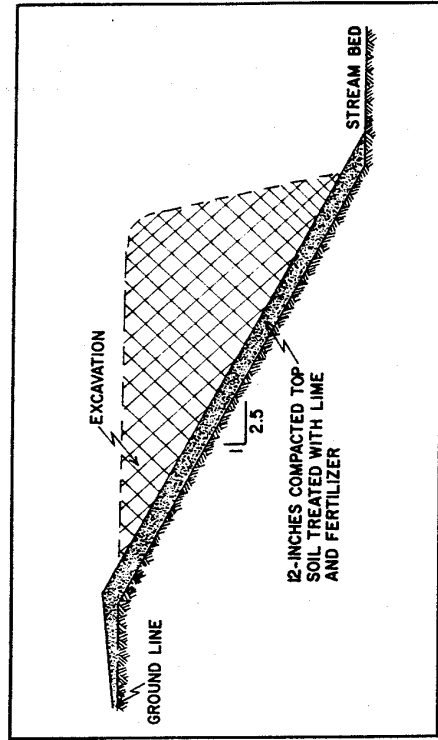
Johnson Creek Study Reach No. 2: Cross section of typical sloped bank without structural materials
